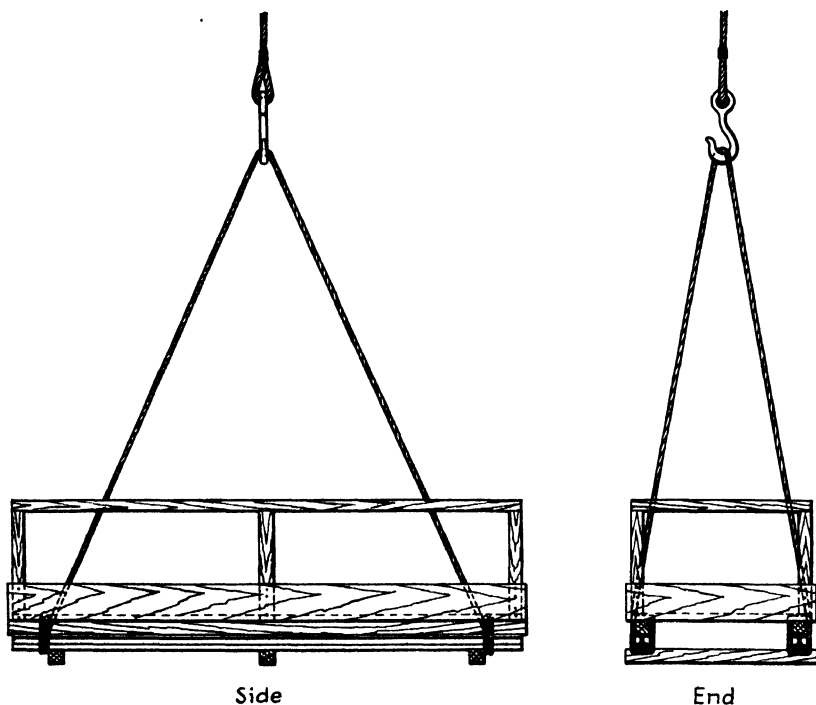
A float supported by the crane for installing horizontal and high bracing.
